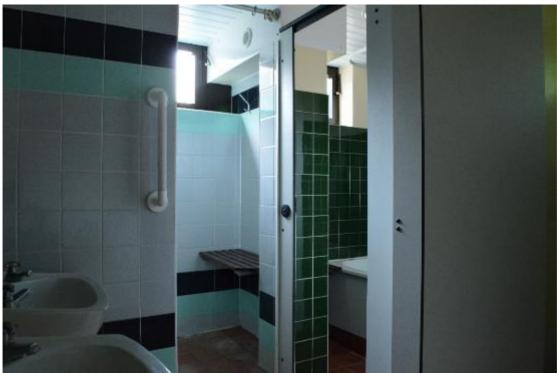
Building 25, typical bathroom interior at ground, first and second floor levels within all blocks (838)
